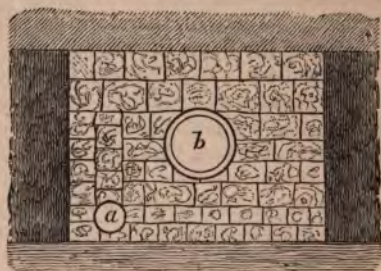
FRAME DAM, Elevation. Scale $\frac{1}{4}$ in. = 1 ft.
